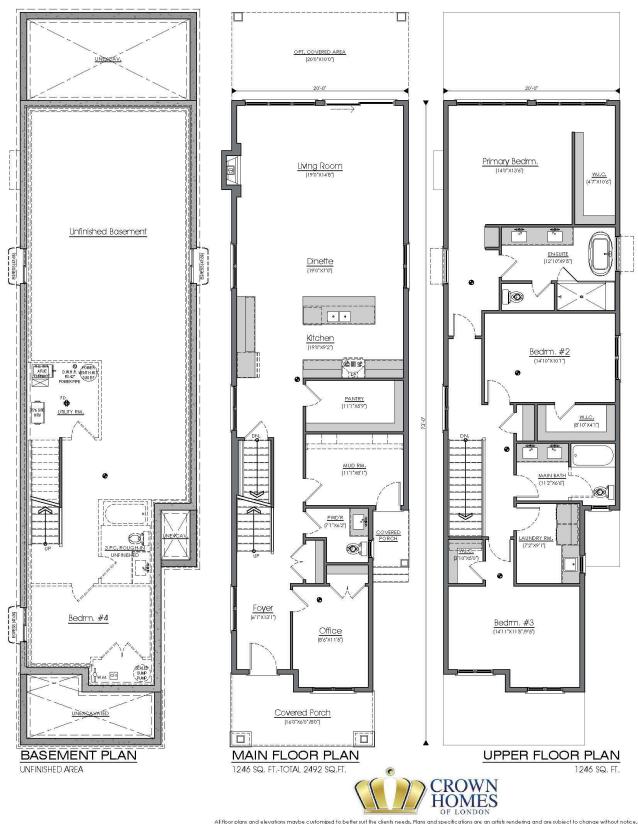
Drawings submitted with the Heritage Alteration Permit application for the property at 54 Duchess Avenue showing the proposed dwelling to be constructed on the property. Note: the final design will include painted wood posts supporting the front porch, constructed to the porch floor rather than brick pedestals. If a railing is required, a traditional painted wood guard will be used.
